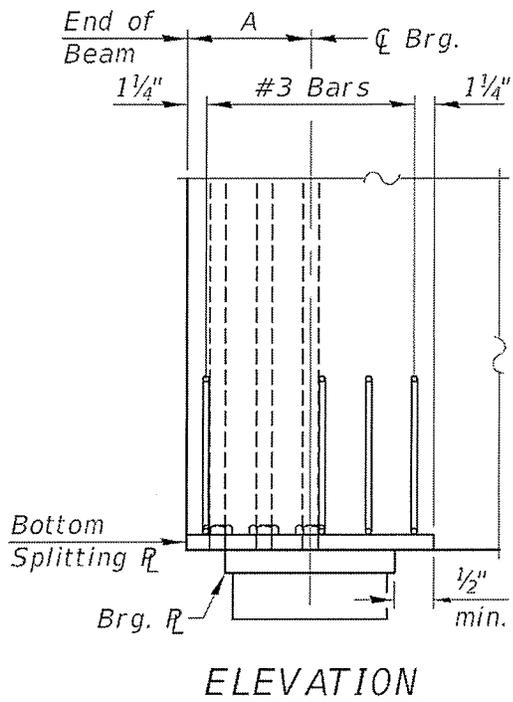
details the bottom splitting plate design details for I-Beams and Bulb T-Beams with bearings. This figure was updated with consistent terminology and shall replace Figure 3.4.8-1 of the Bridge Manual.
